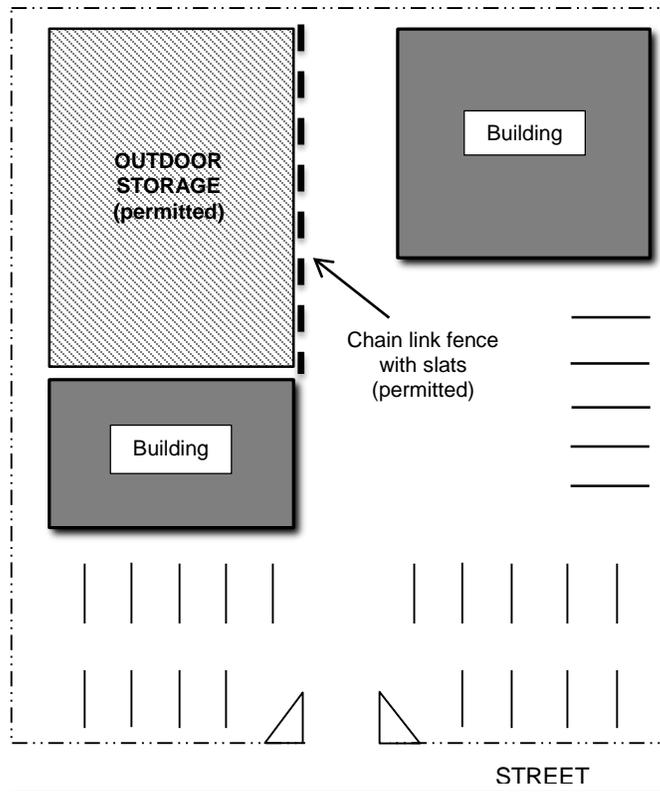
INTERIOR LOT WITH MULTIPLE BUILDINGS
